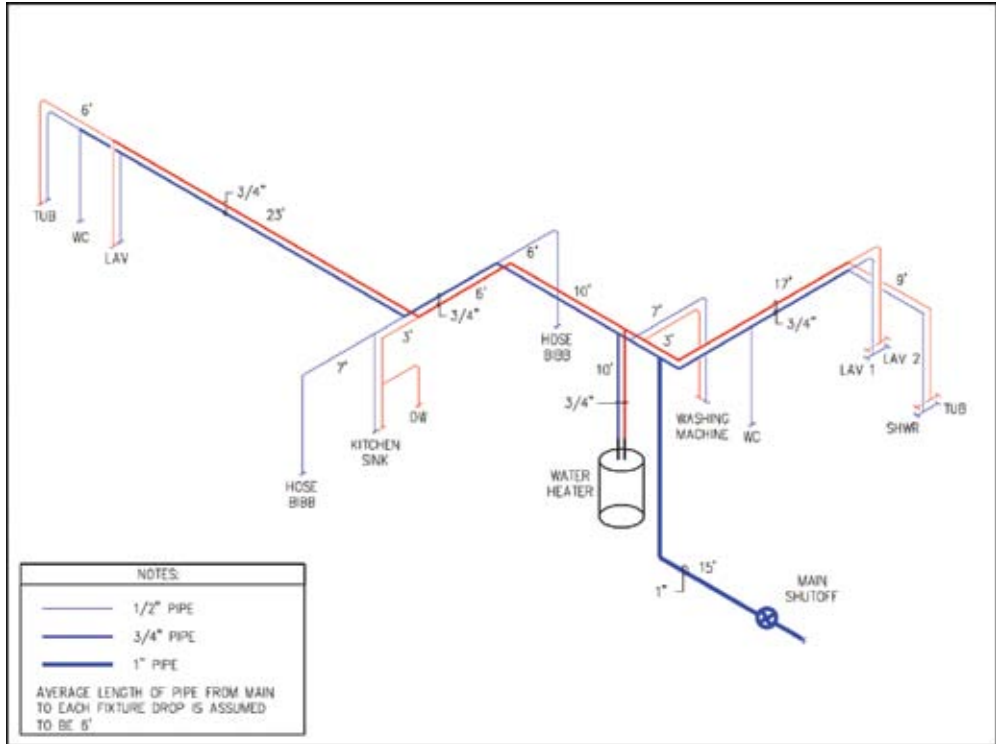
Trunk and Branch Isometric Riser for the Ranch House
